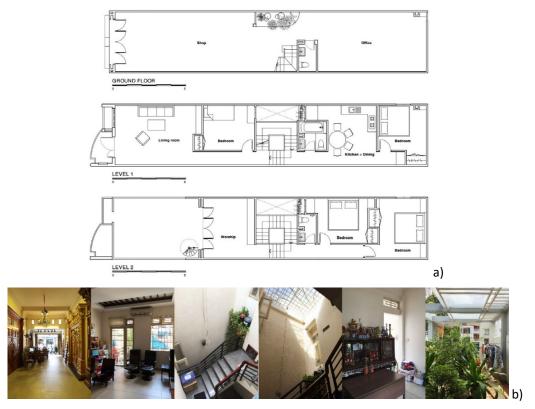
A modern shop-house in HCMC after 1975: floor plans (a), and the exterior and interior (b)
